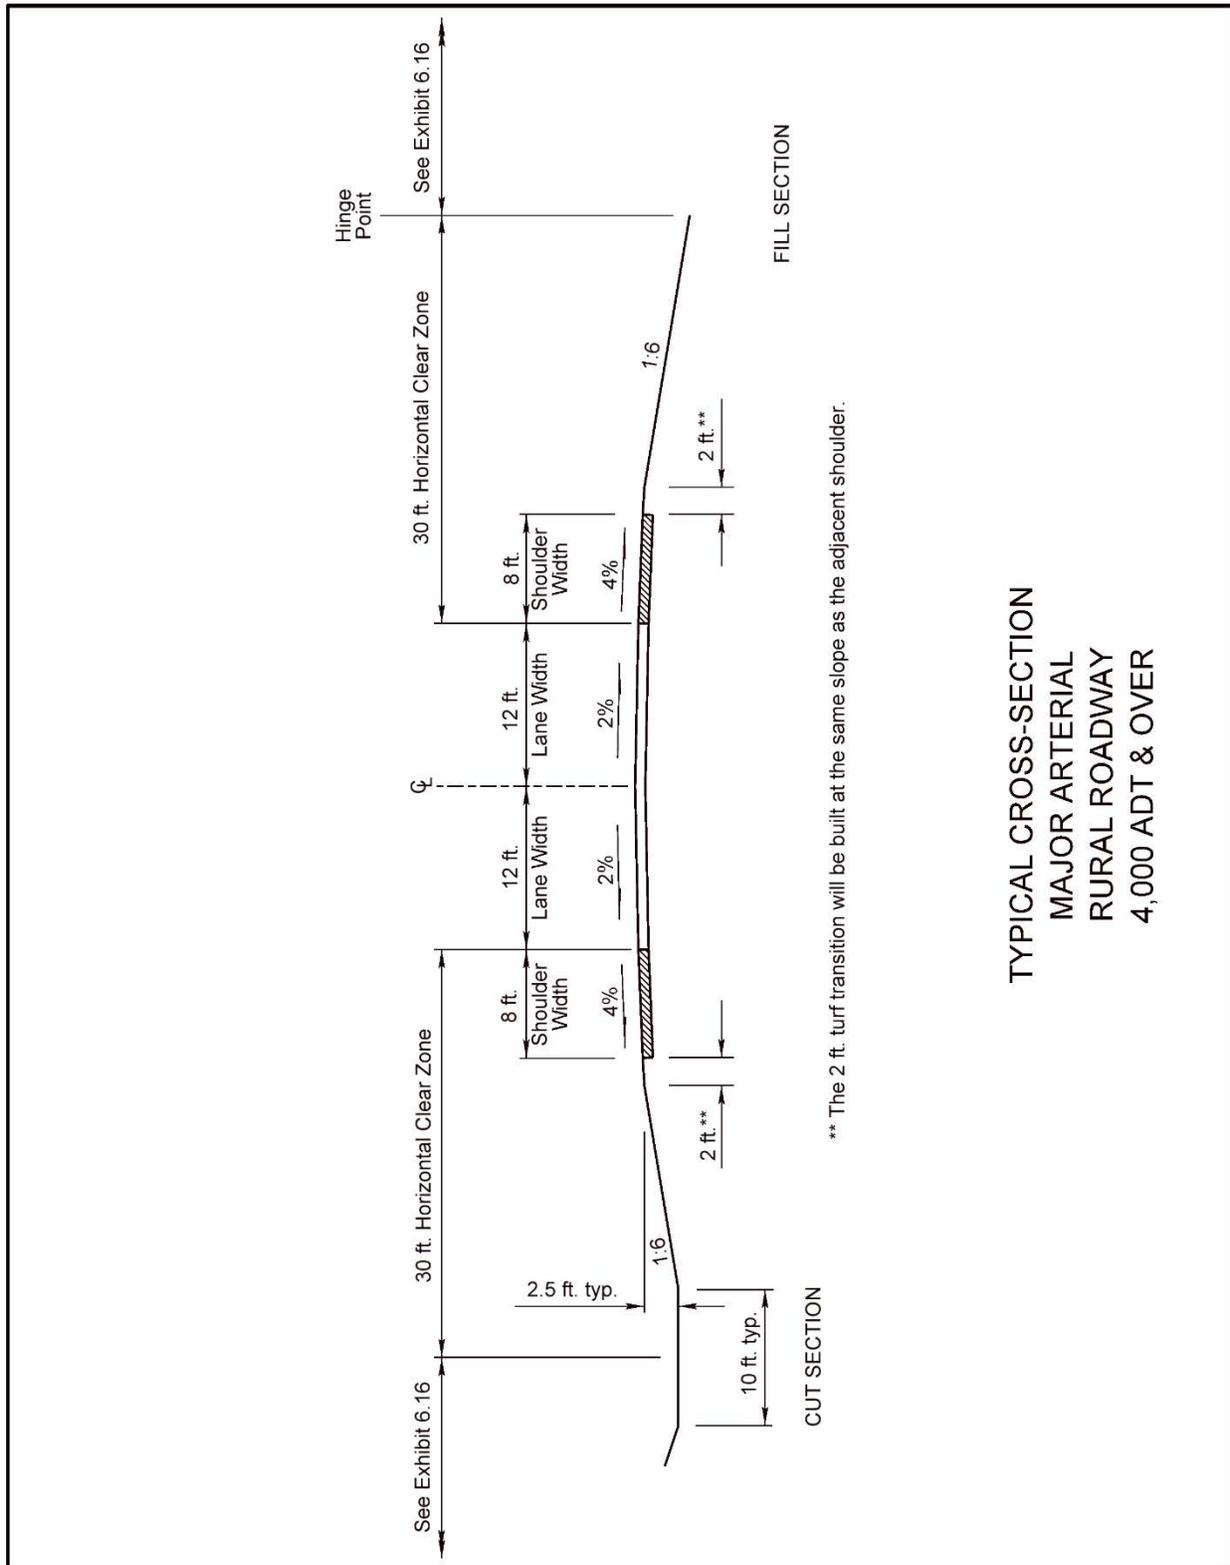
Typical Section - Rural Major Arterial 4,000 ADT and Over
